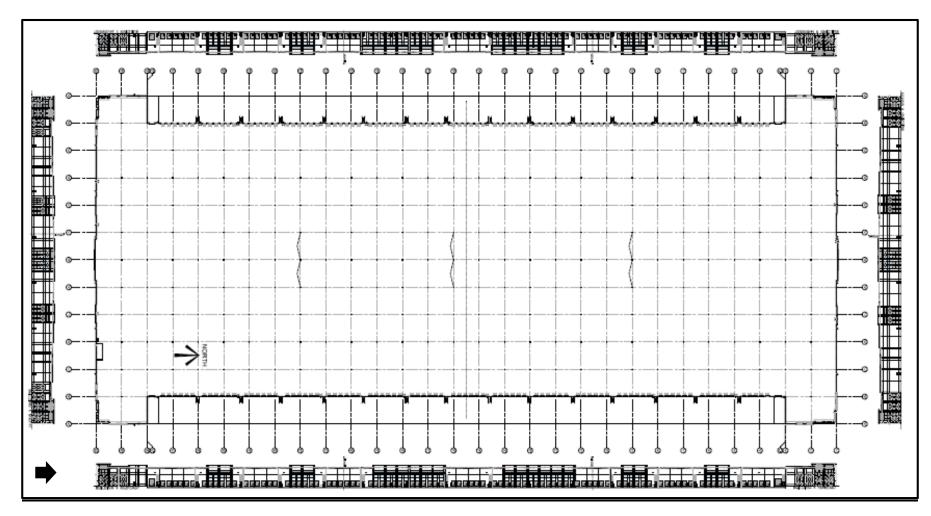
Exhibit N (Building 9) – FLOOR PLAN & BUILDING ELEVATIONS
